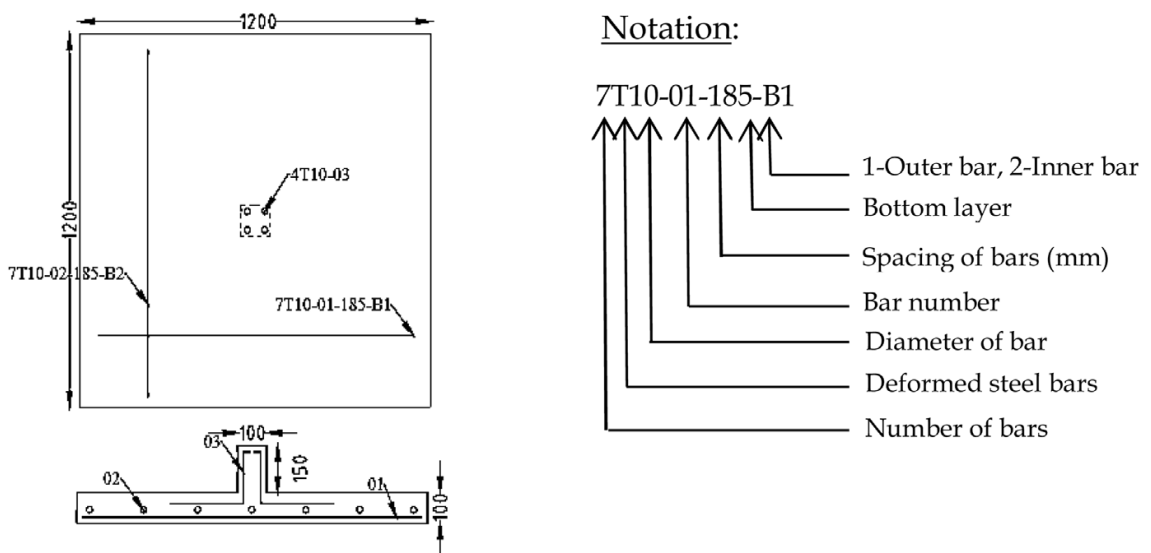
Reinforcement Detail (Silva et al., 2019)
